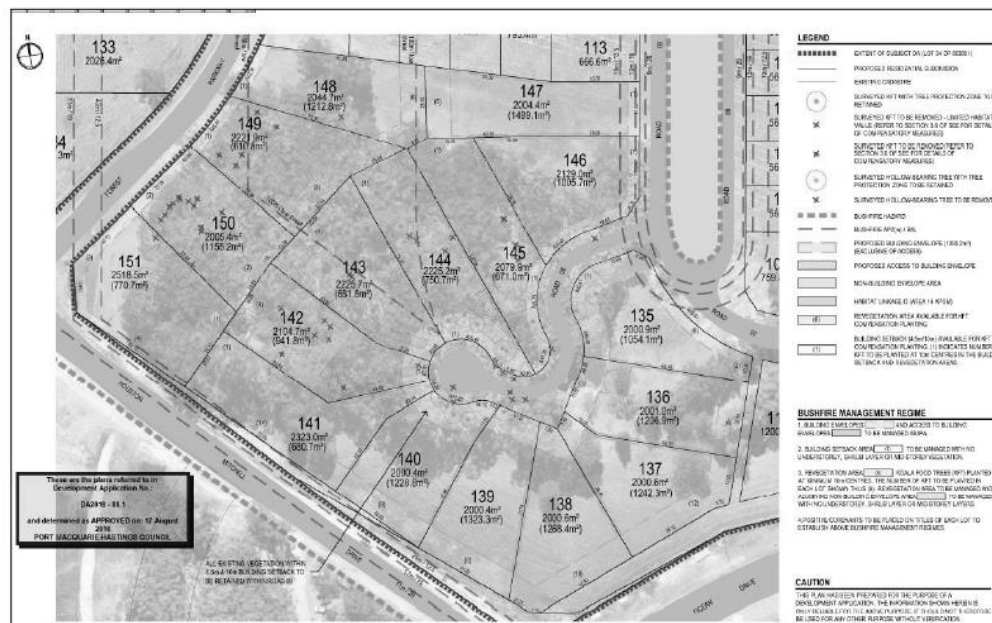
DA 2016/88 Original Subdivision Layout Approval Close Up E4 land – Extract
